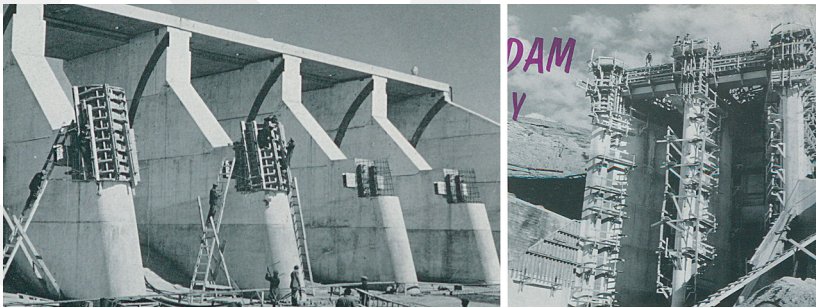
Left: View of part of the dam’s concrete spillway structure source: “Seyhan Dam at halfway in Turkey”. *The Em Kayan* 14, no 3. (May 1955): 3–5. Right: Concrete intake structure, shown at its 24-meter level, grows toward its 64-meter level. Source: “Seyhan Dam at halfway in Turkey.” *The Em Kayan* 14, no. 3. (May 1955): 3–5. Courtesy of Boise State University Library Special Collections and Archives.
